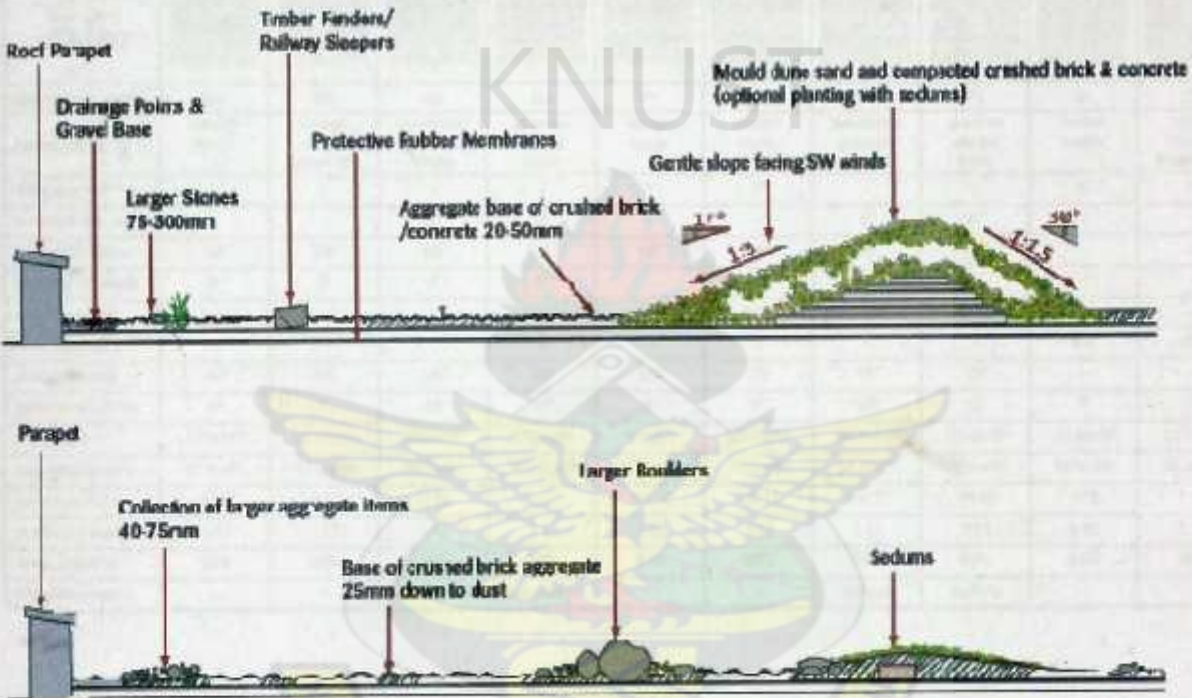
Detail of contouring effect of roof garden (source: Black redstarts.org .uk:
